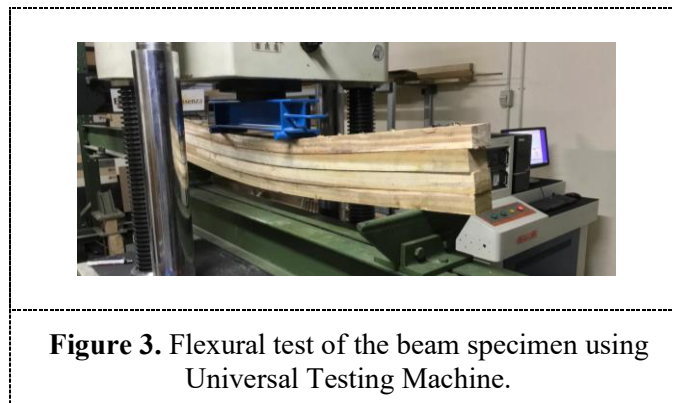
show the testing process for one specimen of laminated timber beams. The test method is the four-point loading test with a distance of 500 mm (1/3 beam span). Furthermore, Figure 4 show the variety of beam failures that occur in the test object, namely simple tension, this is in accordance with one of the flexural test object failure models based on ASTM D143 [2] so that the expected failure occurs in accordance with the test results.
